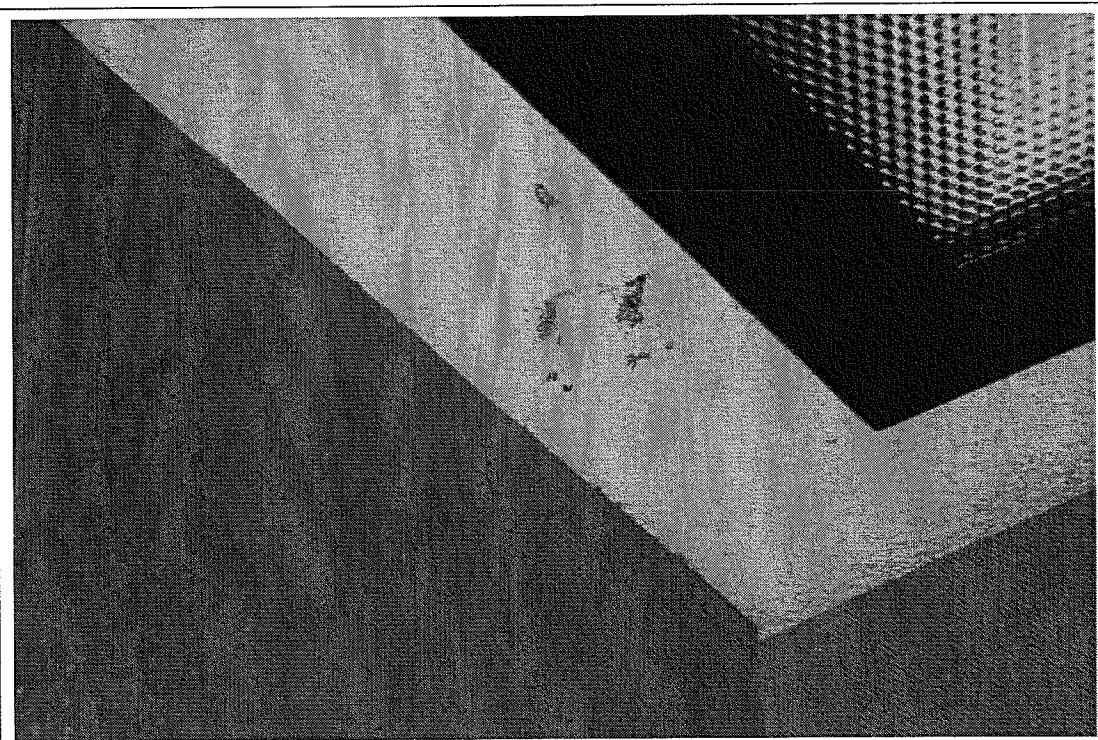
3rd floor, outside room 311 - Impact damage at recessed light fixture
